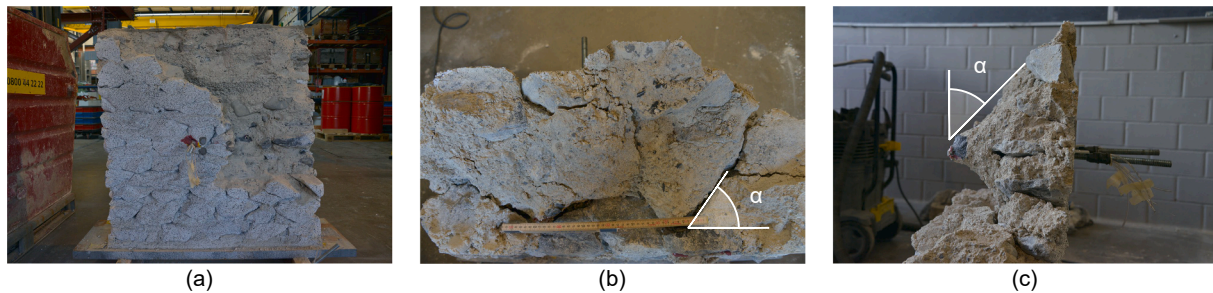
Damage observed for IA specimens during demolition: (a) separation of masonry leaves (IA1); (b) top view of the breakout failure (IA3); (c) lateral view of the breakout failure (IA3).
